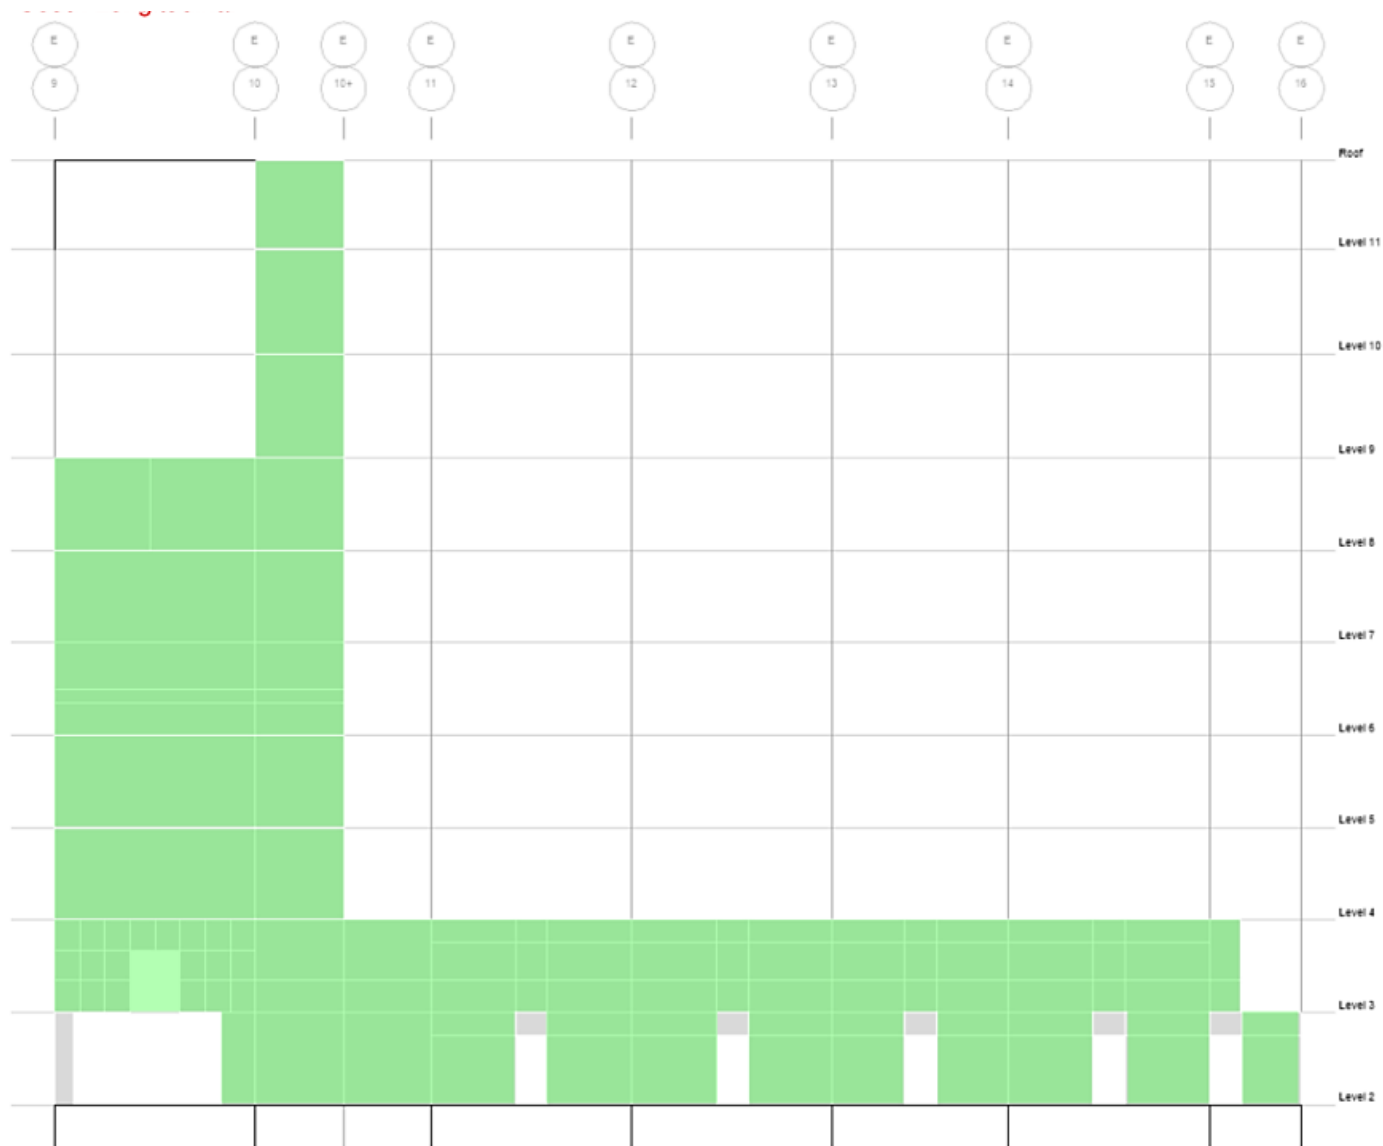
, Gridline E Longitudinal Direction Wall – South Structure
